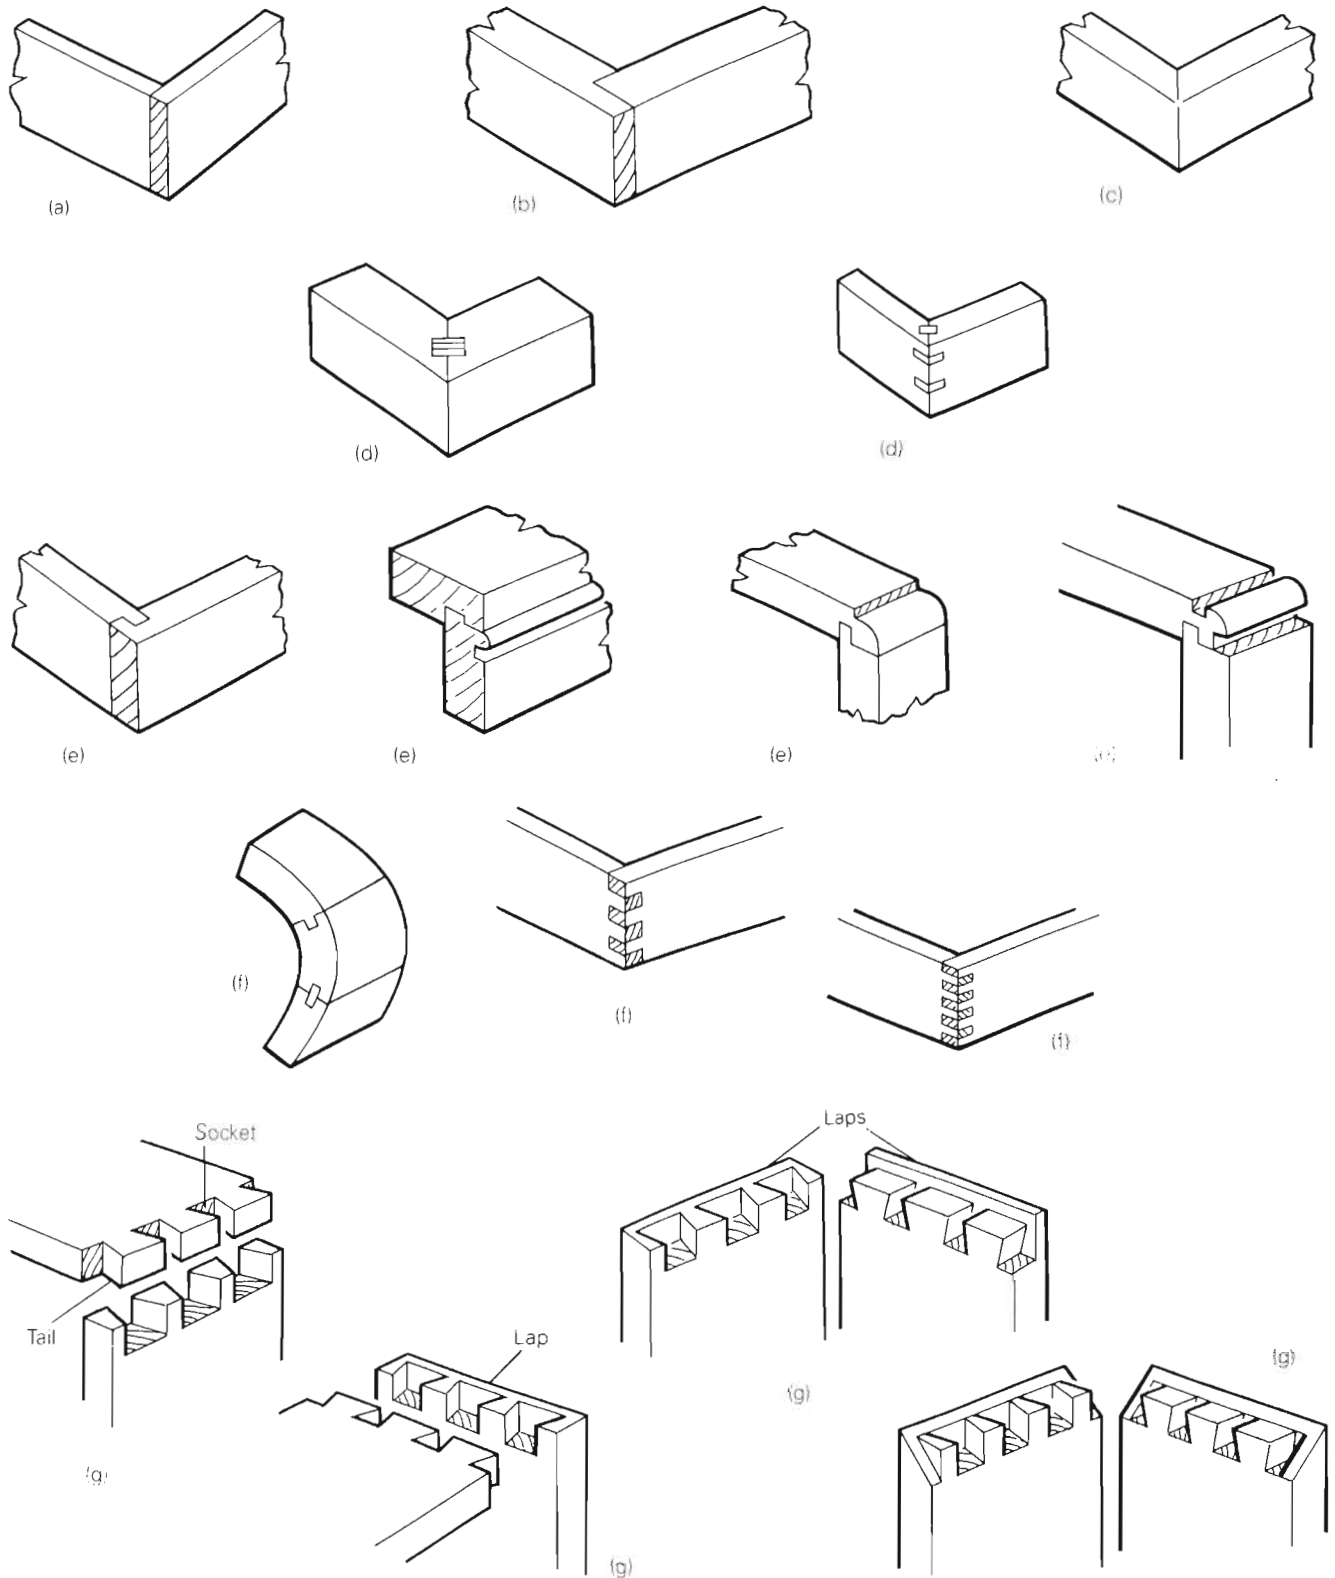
Angle joints: (a) butt joint, (b) rebated butt joint, (c) plain mitre joint, (d) rebated and mitred angle joints, (e) housed and shouldered joints, (f) comb joints, (g) dovetail joints.
